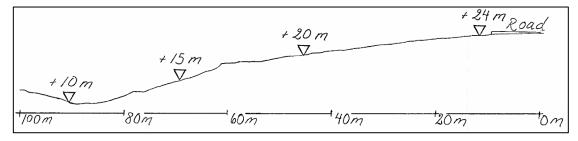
Cross-section of the area left of the road, at road section 27/160 m.
